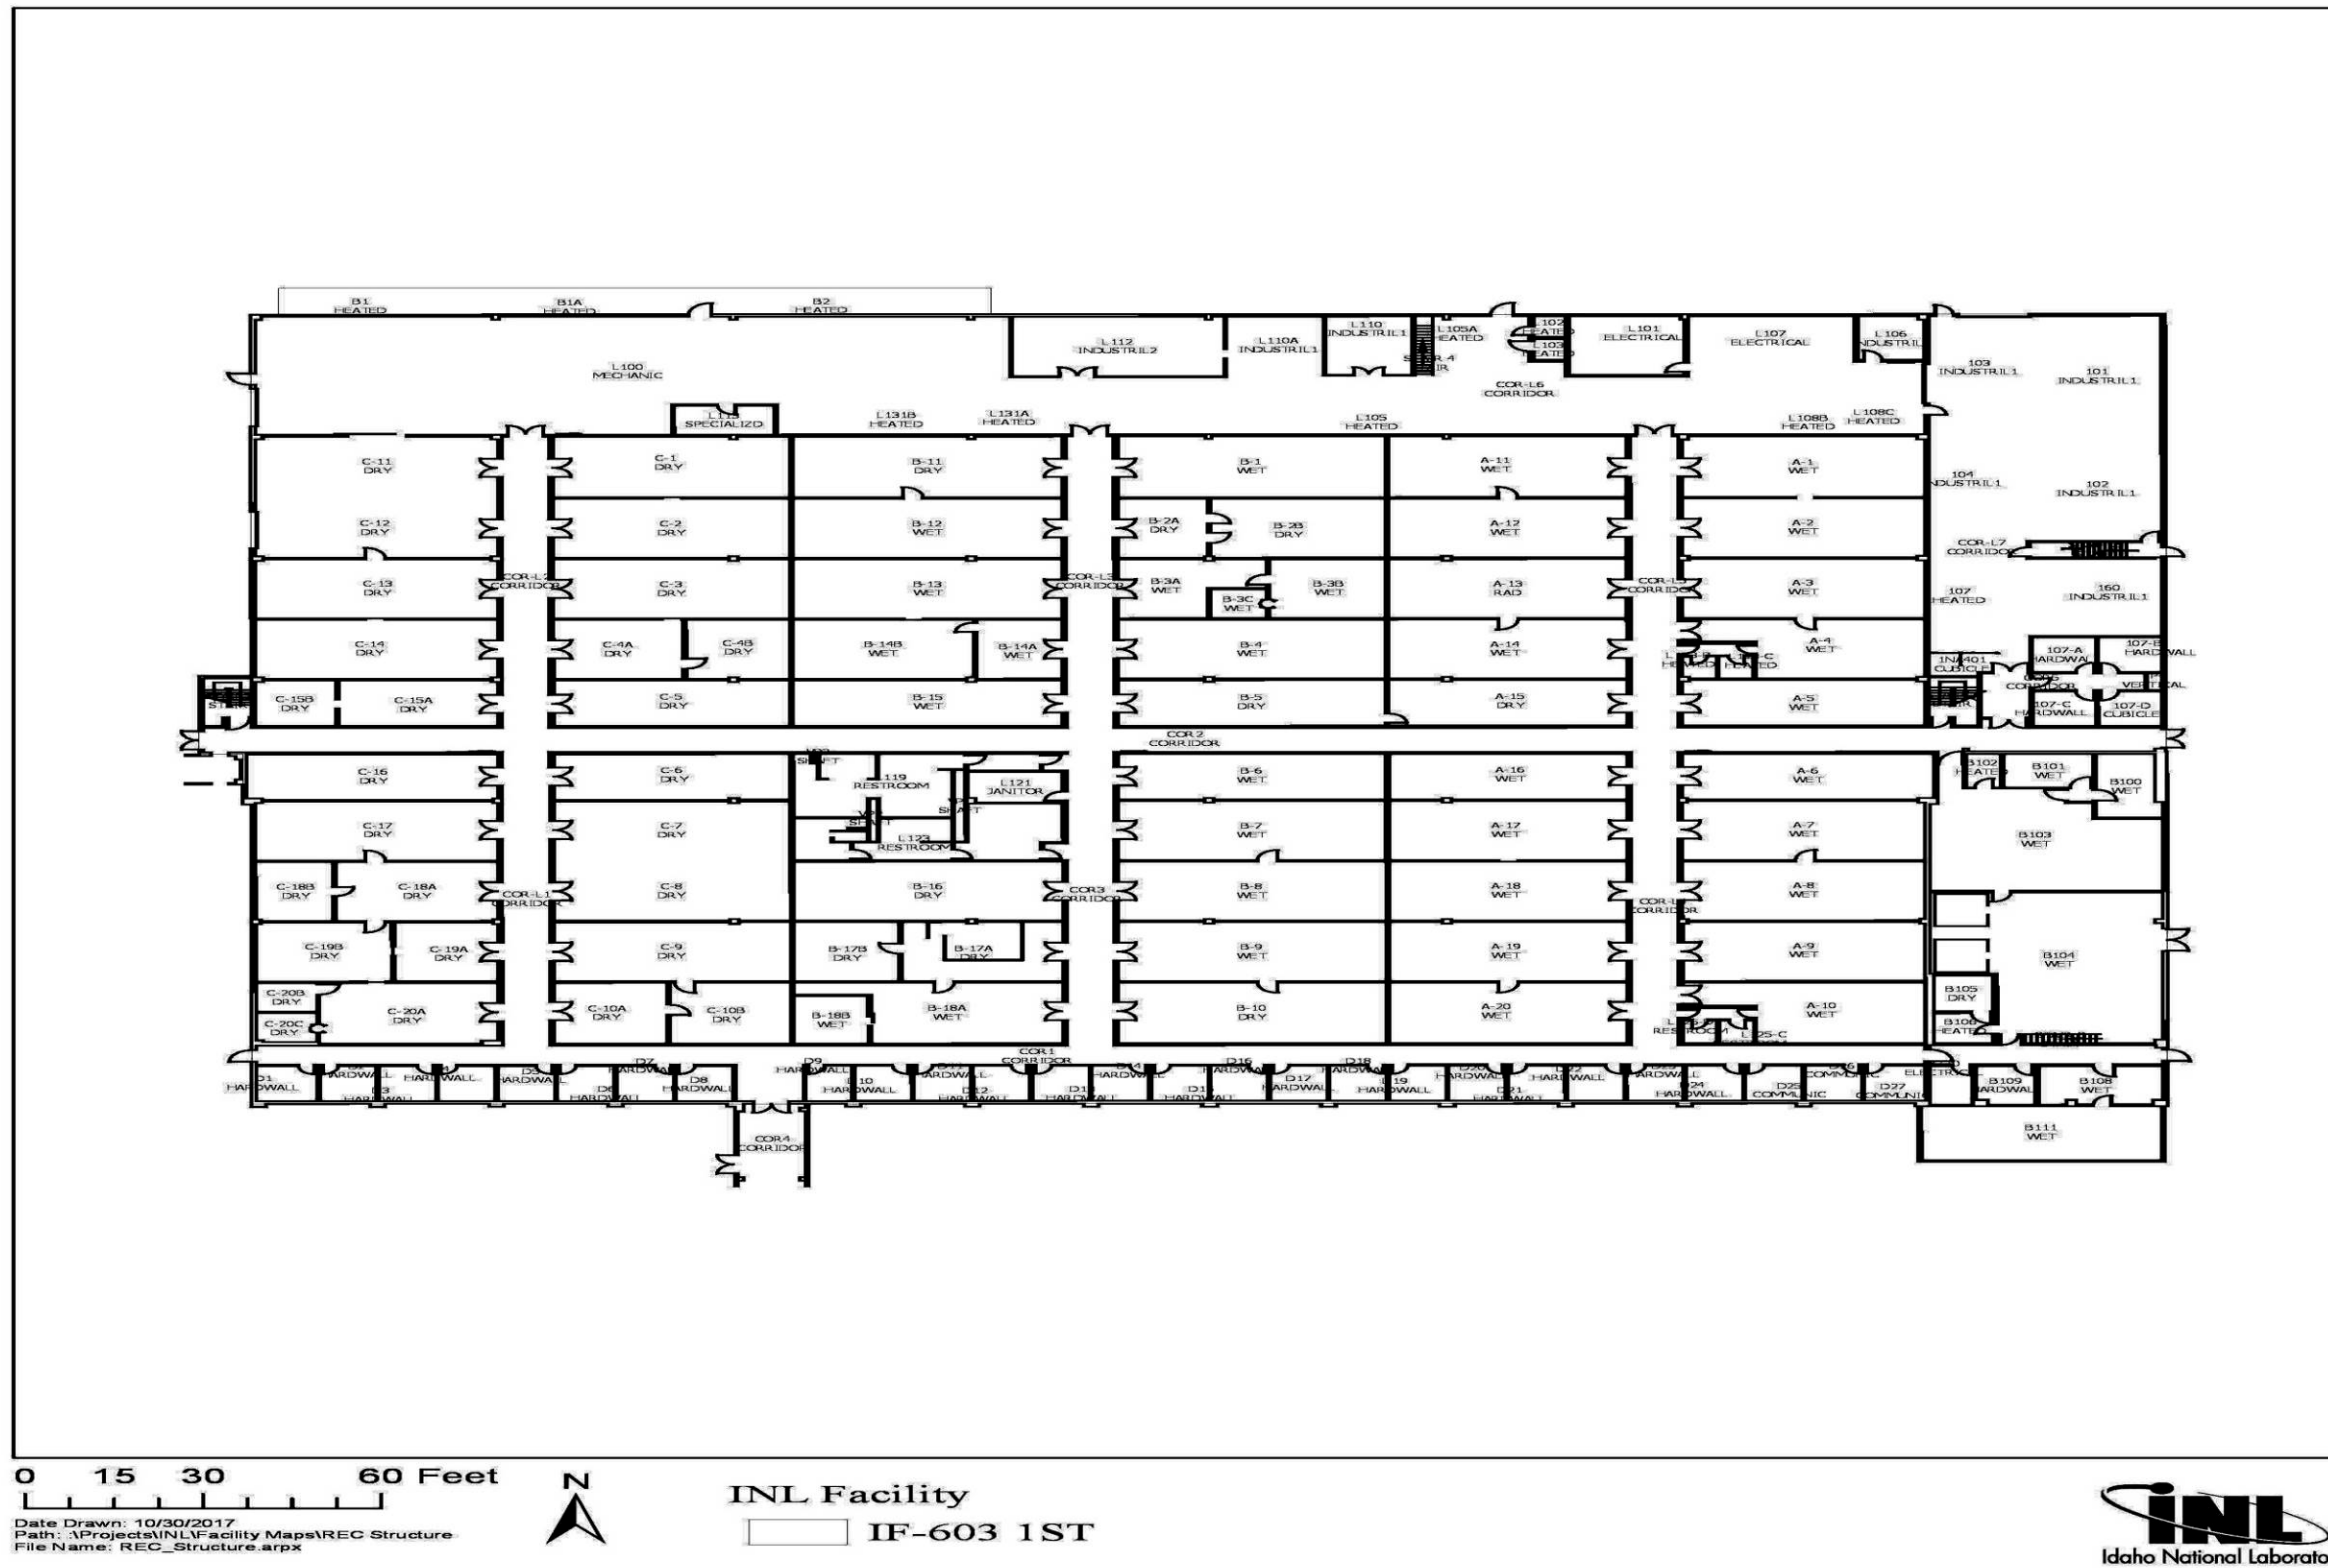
IRC Laboratory Building (IF-603) floor plan (1st floor).
